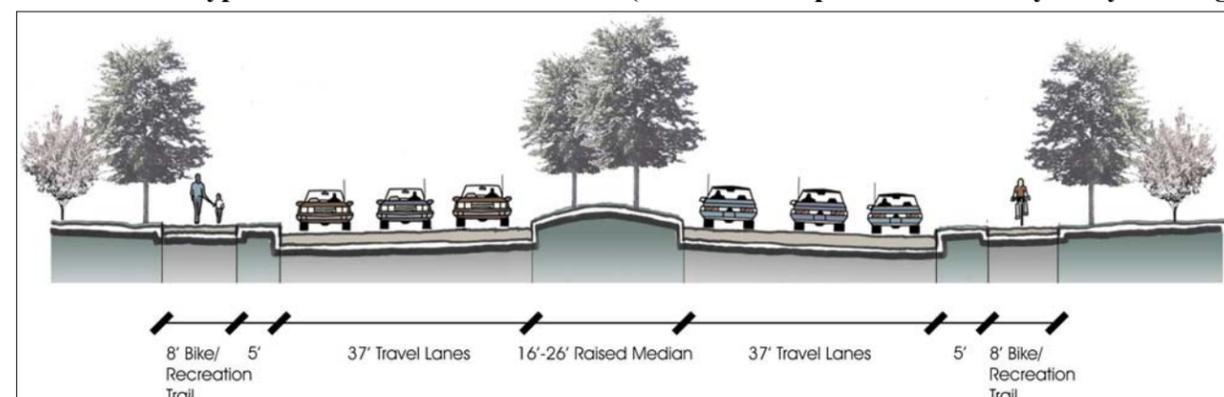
Typical Cross-Section – Route 221 (Route 663 to West of Enterprise Drive)
